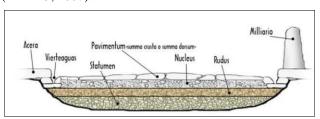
Floor of Via Appia, in Rome Source: Balbo (2007).
